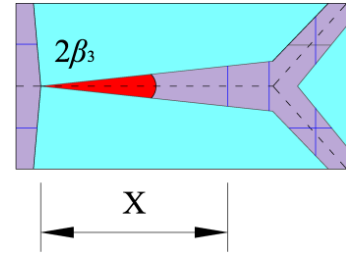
Rebar extension in slab central horizontal crack
